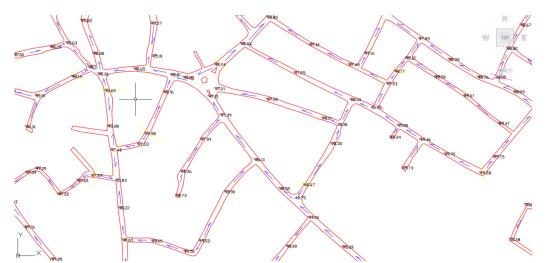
Flow direction in each street generated manually in Auto CAD environment according to road elevation.
